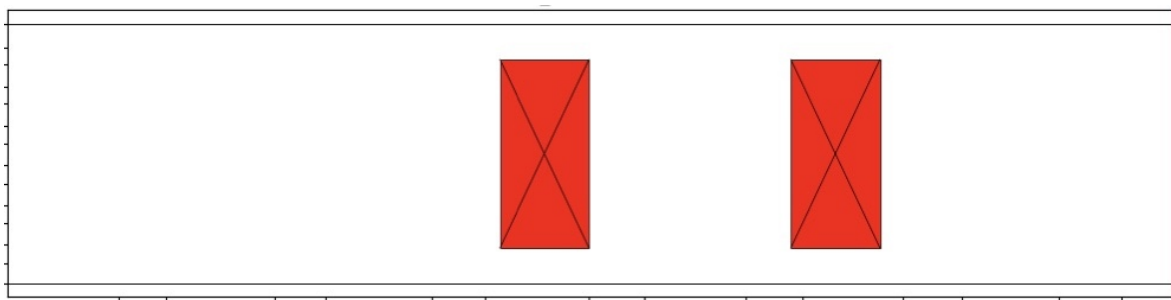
An example of a typical facade section from floor to floor. In this case, the floor has two windows (in red).
